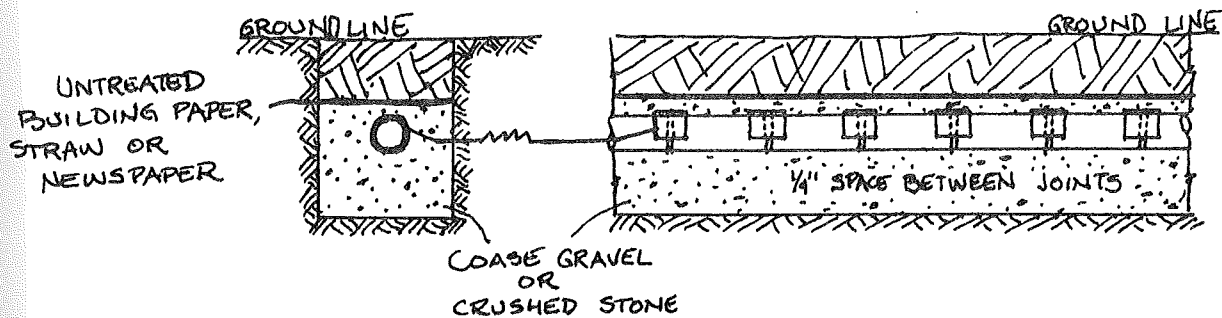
DISPOSAL TRENCH CONSTRUCTION
